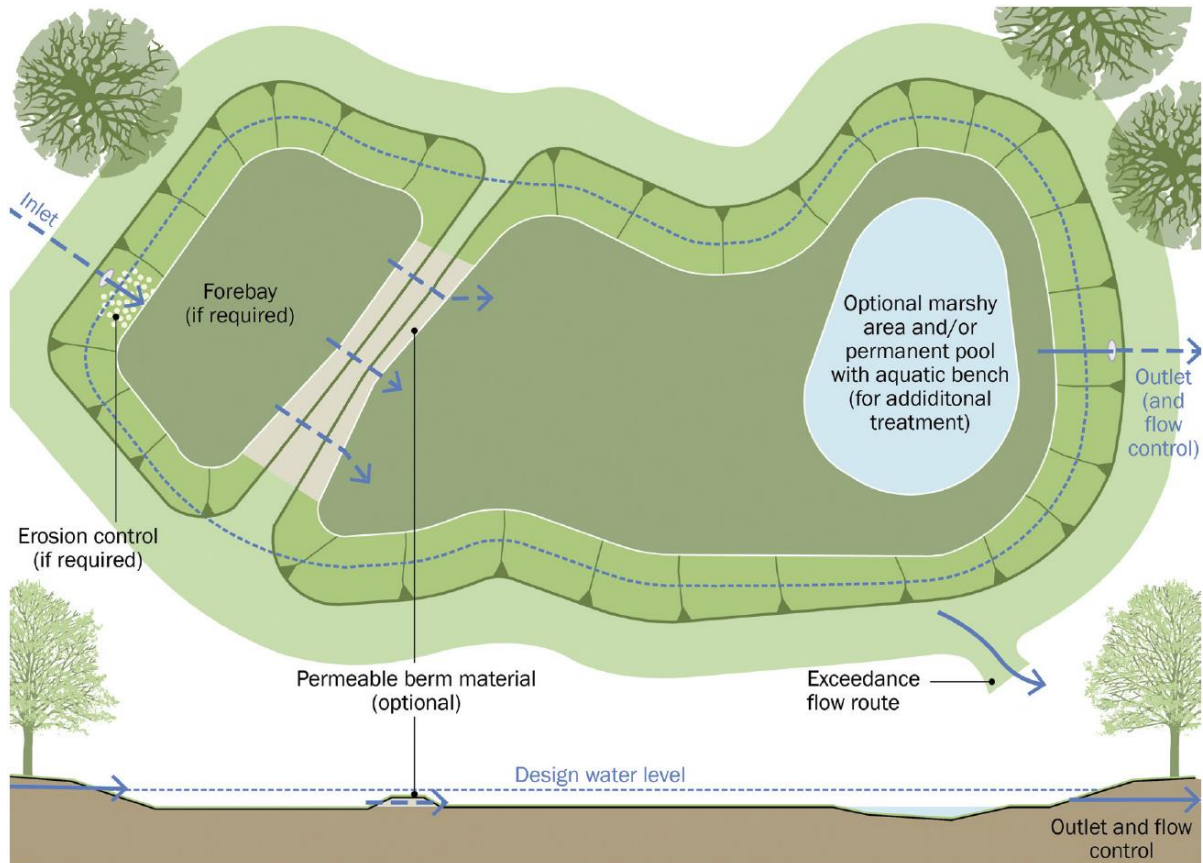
Typical plan view and profile for the design of a dry pond (Woods Ballard et al. 2015 with courtesy of CIRIA).
